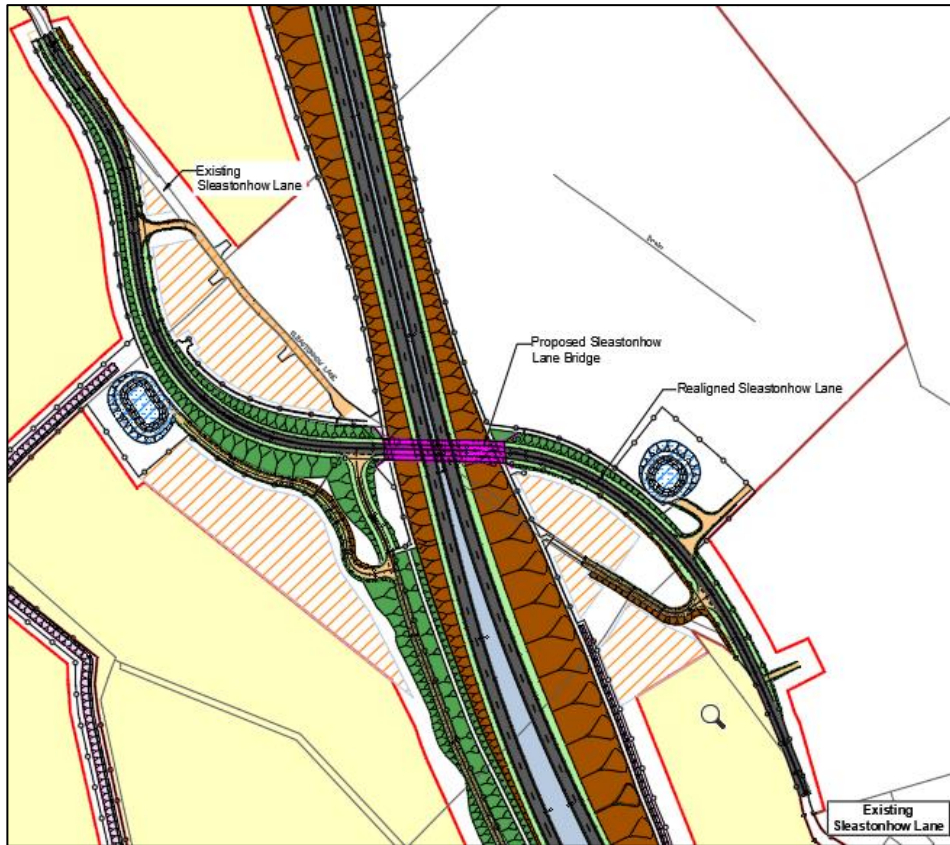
(a) Extract from General Arrangement Drawing (Before)
